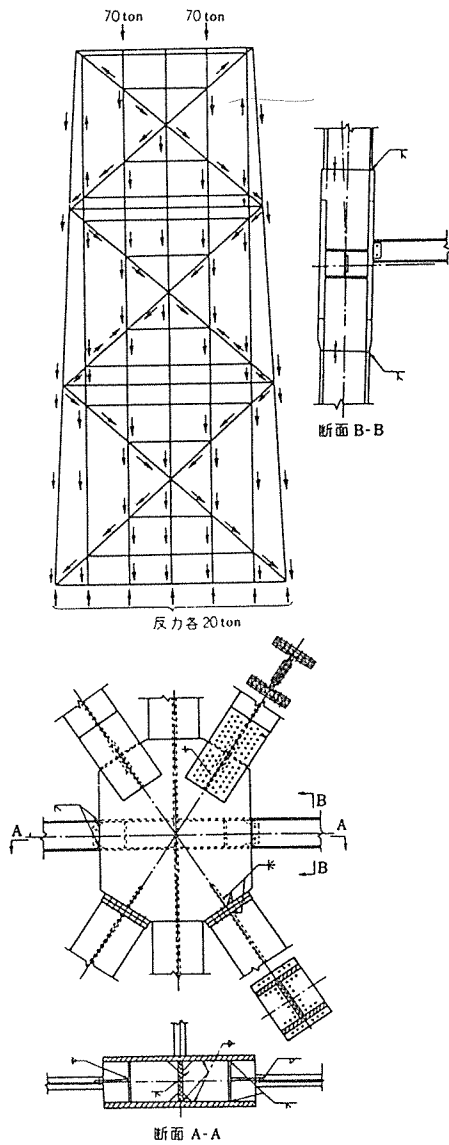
Details of trusses, claddings and windows Fig. 6 Force distribution to columns and Details
